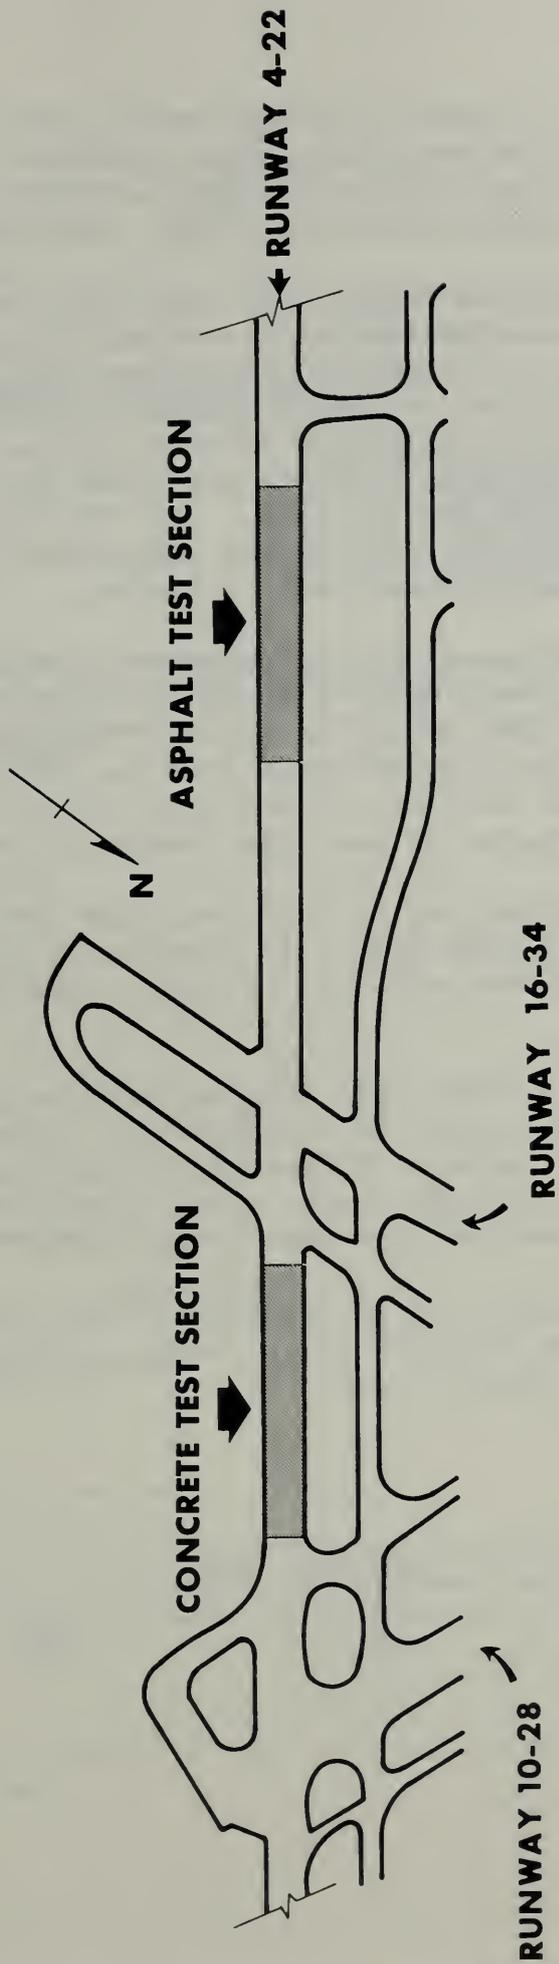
PLAN OF RESEARCH RUNWAY 4-22 WALL OPS STATION, VIRGINIA SHOWING THE LOCATIONS OF THE CONCRETE AND ASPHALT TEST SECTIONS
